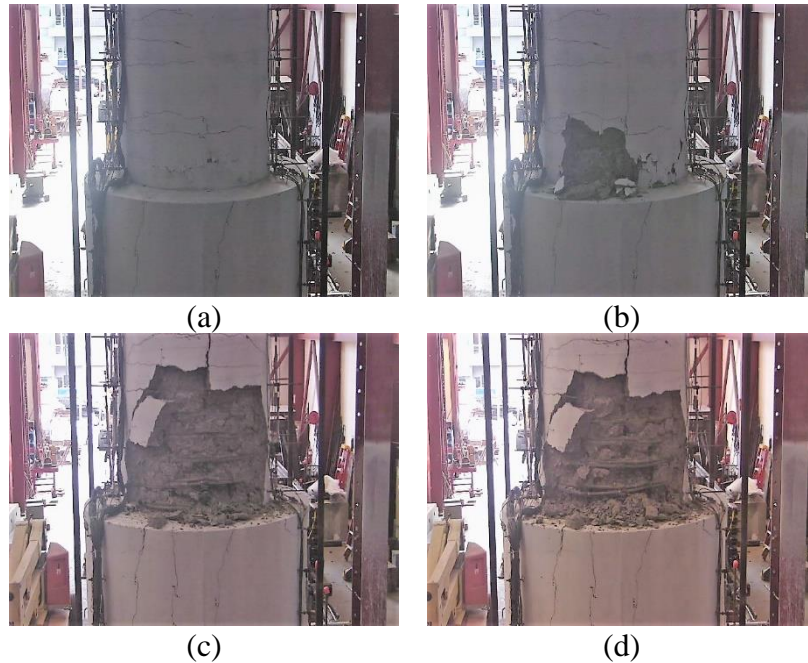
North Face of Column Plastic Hinge at Key Points During Test; (a) Concrete Flaking; (b) Concrete Spalling; (c) Bar Buckling and Fracture; (d) Severe Bar Fracture and Hoop Dilation
